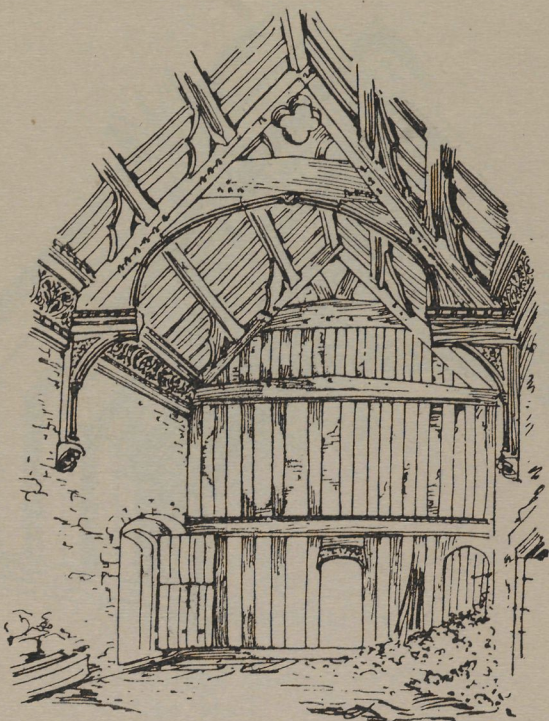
HAMMER-BEAM ROOF, COCHWILLAN
